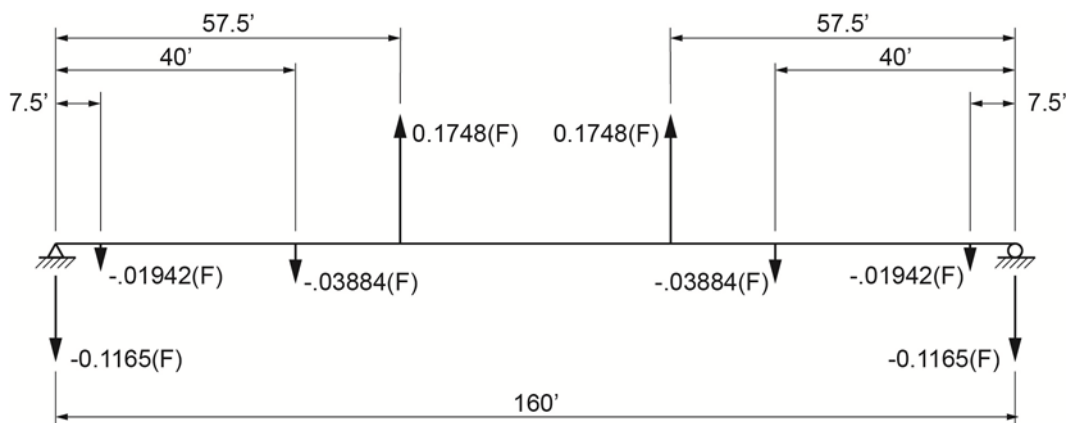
Conjugate Beam and Loads (Main Span)
